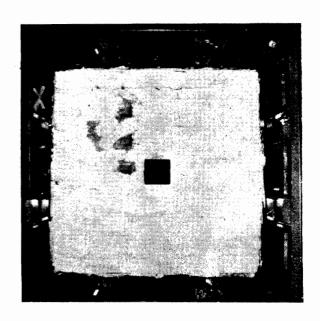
BOTTOM VIEW OF SLABS AFTER FAILURE
